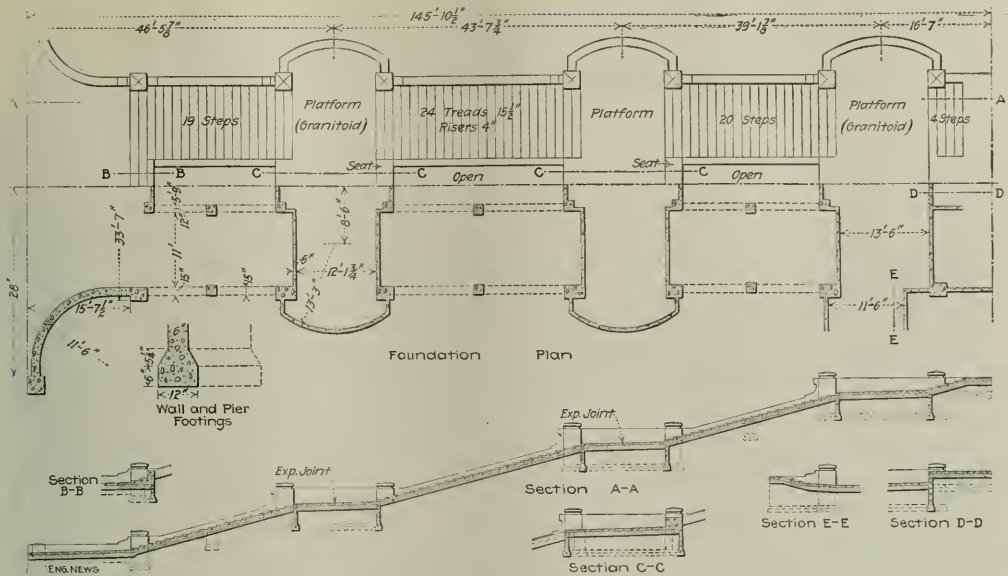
PLAN AND CROSS-SECTION OF CONCRETE STAIRWAY ON THE SLOPE OF GOVERNMENT HILL IN FOREST PARK, ST. LOUIS, MO.
